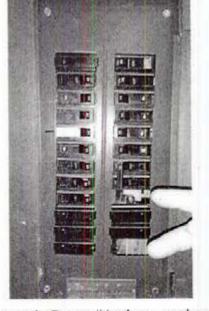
Supply Room #4; view of damaged breaker Photo 12: Supply Room #4; close-up view of exposed conductors in breaker panel.
